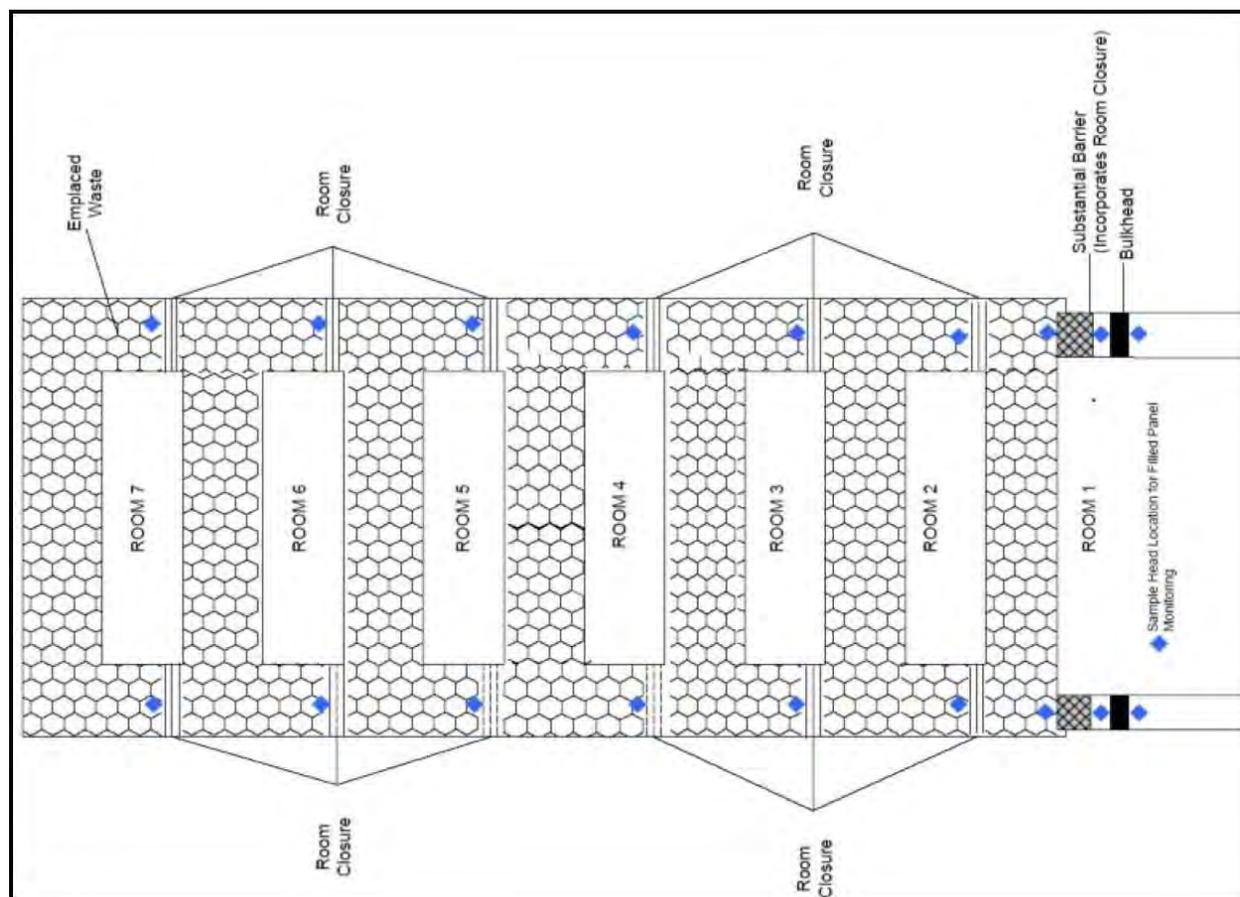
Plan view of typical disposal panel showing disposal rooms separated by brattice cloth ventilation barriers (room closures) and gas sampling locations in the inlet and outlet sides of each of the seven disposal rooms.
